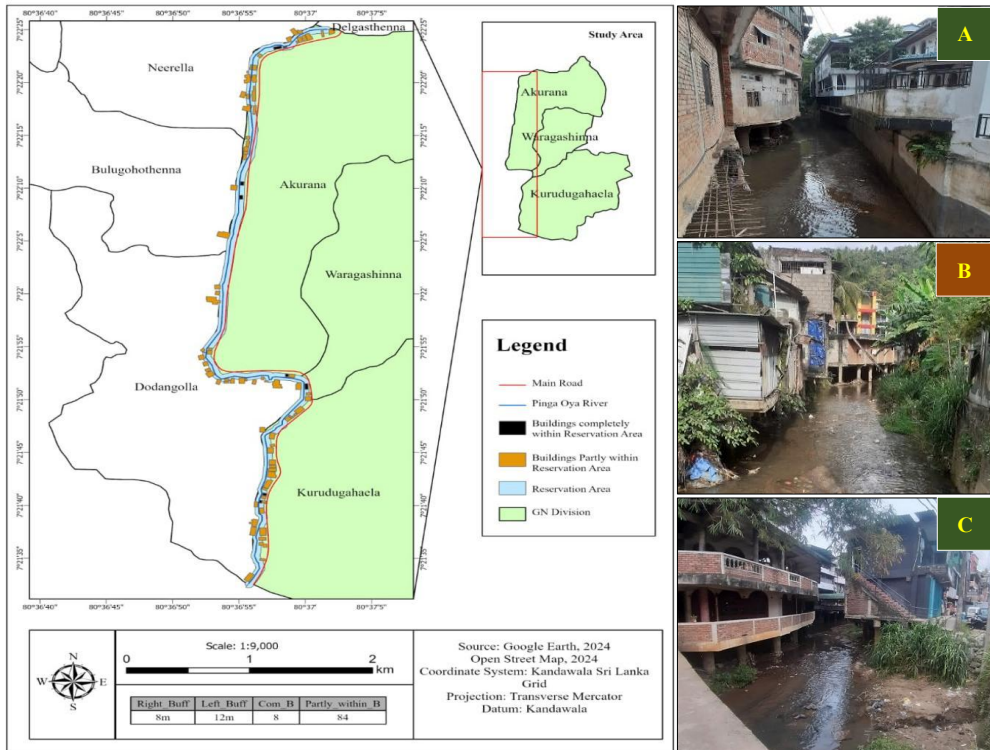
Building Construction – Reservation Area, Figure 15: Construction of Buildings A-C (Source: Field Survey, 2023/24)
